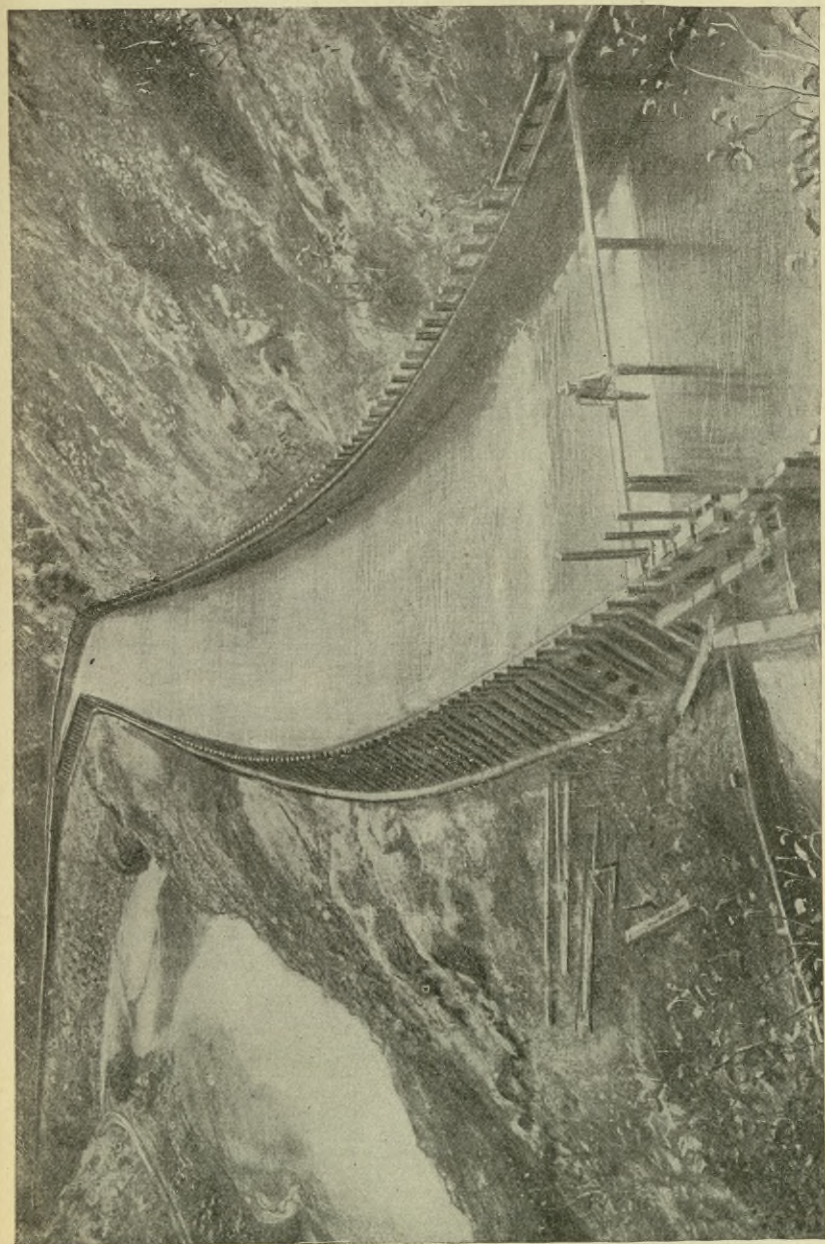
PLATE XIX.—HIGHLINE CANAL, COLORADO. VIEW OF BENCH FLUME. ESCAPE IN FOREGROUND.
